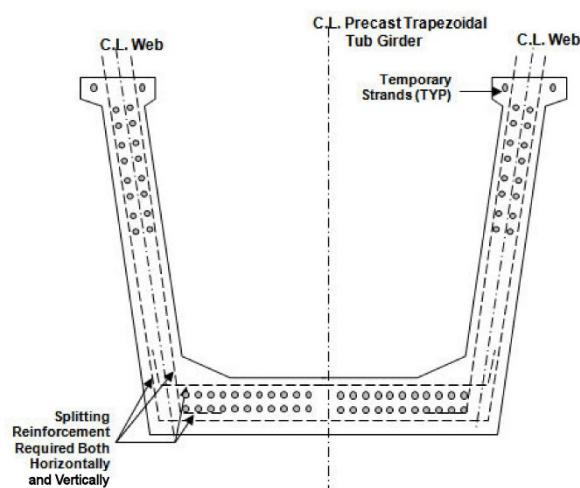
Precast Trapezoidal Tub Girder
